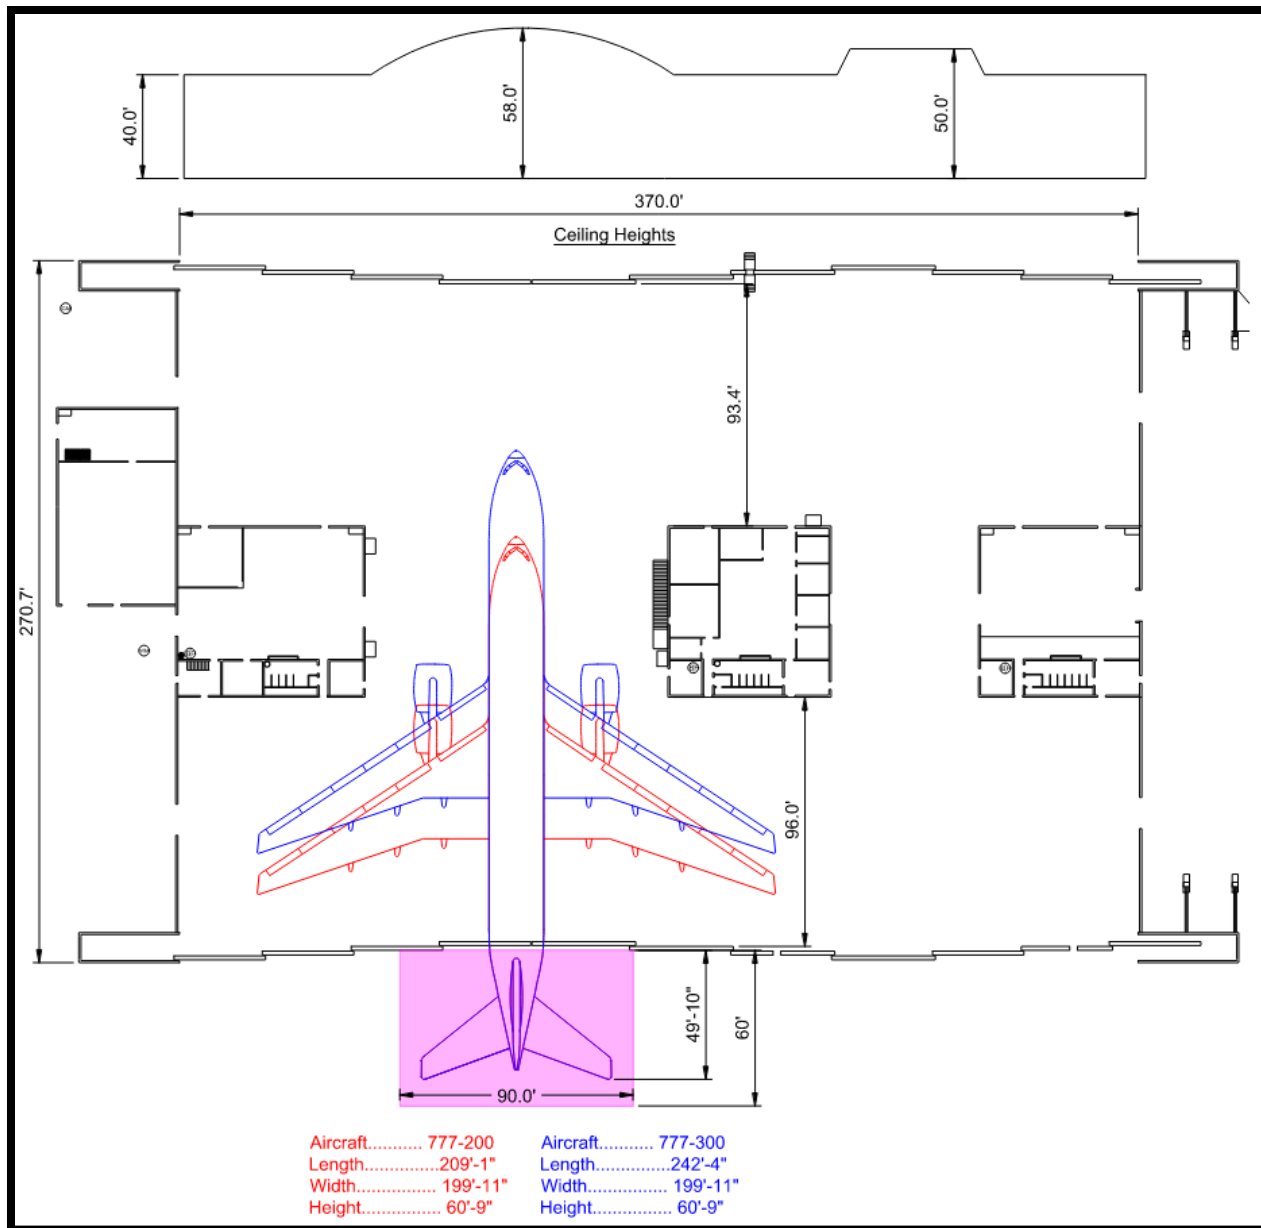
Project Floor Plan for Hangar 959
